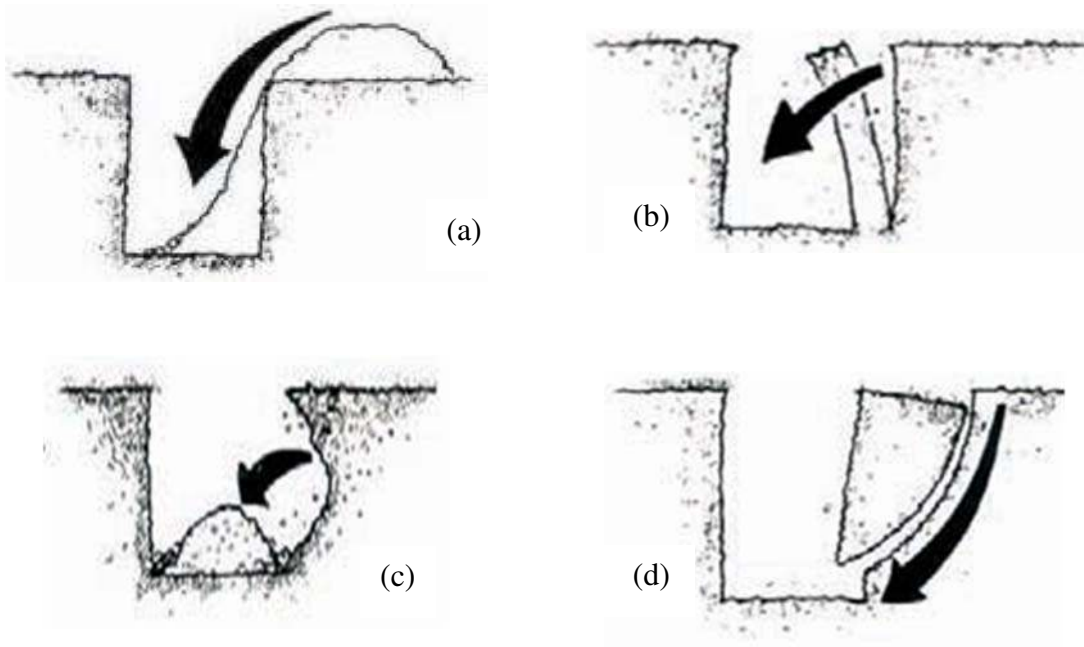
Trench failure modes (Manitoba 2011)
